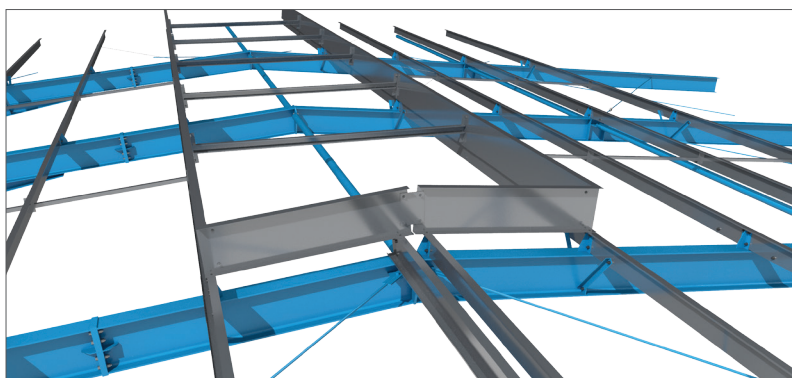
Detail of the skylight frame front - shaped according to the roof ridge
